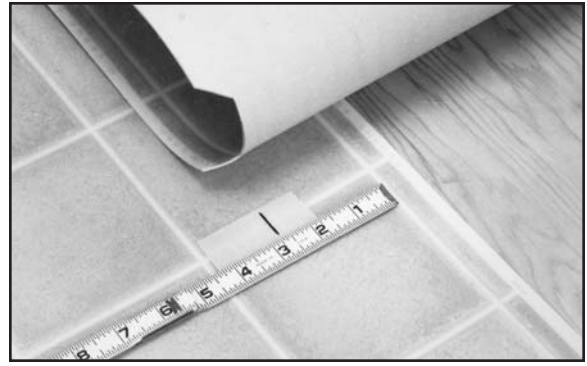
Align perpendicular lines; adjust each end of the sheet to the same distance to acquire a design match.
